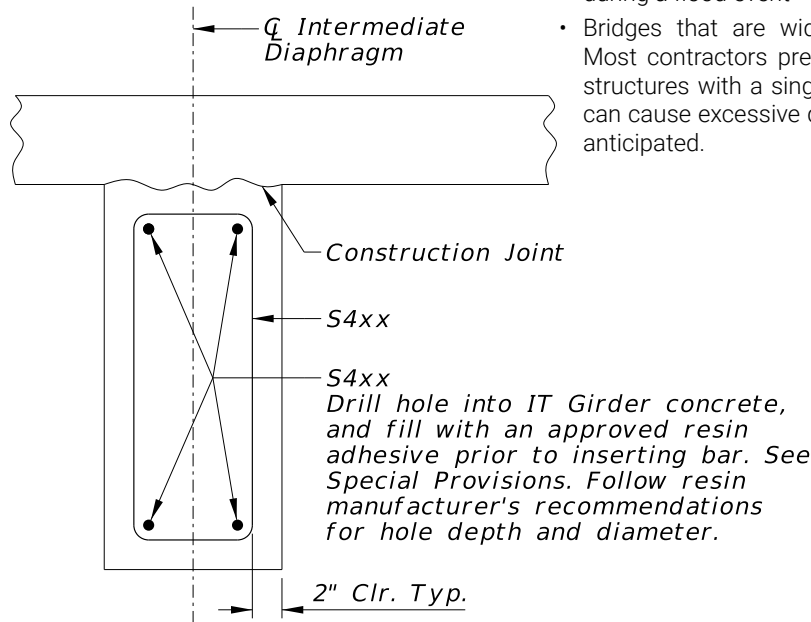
IT Girder Intermediate Concrete Diaphragm
